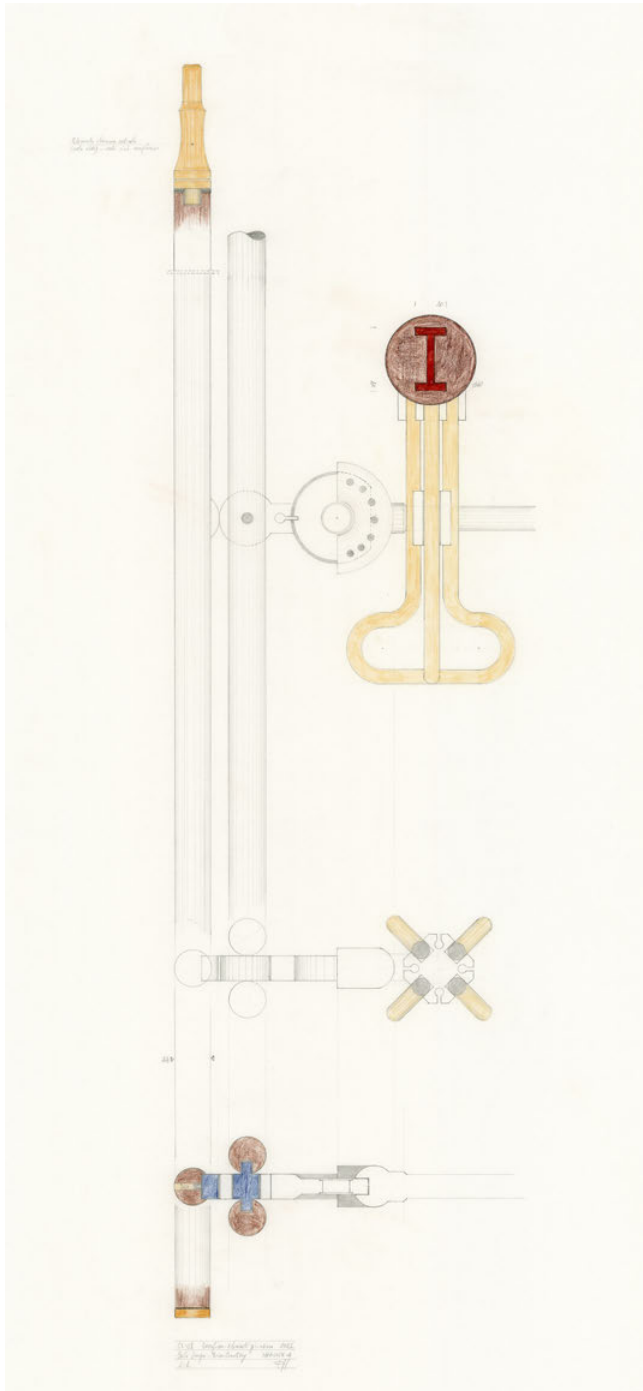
Brion Cemetery. Structure of the crucifix and connecting elements between the wooden rods (Tempietto). Drawing by Enrico Miglietta. Pencil and coloured pastels on paper, 930 × 430mm, scale 1:1
